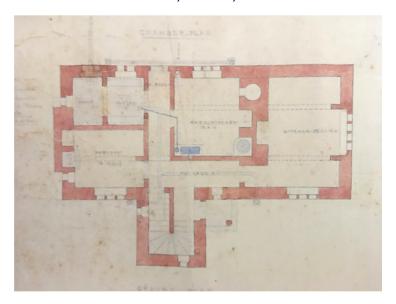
Ground floor plan of The Lodge House by Bucknell (1871)
